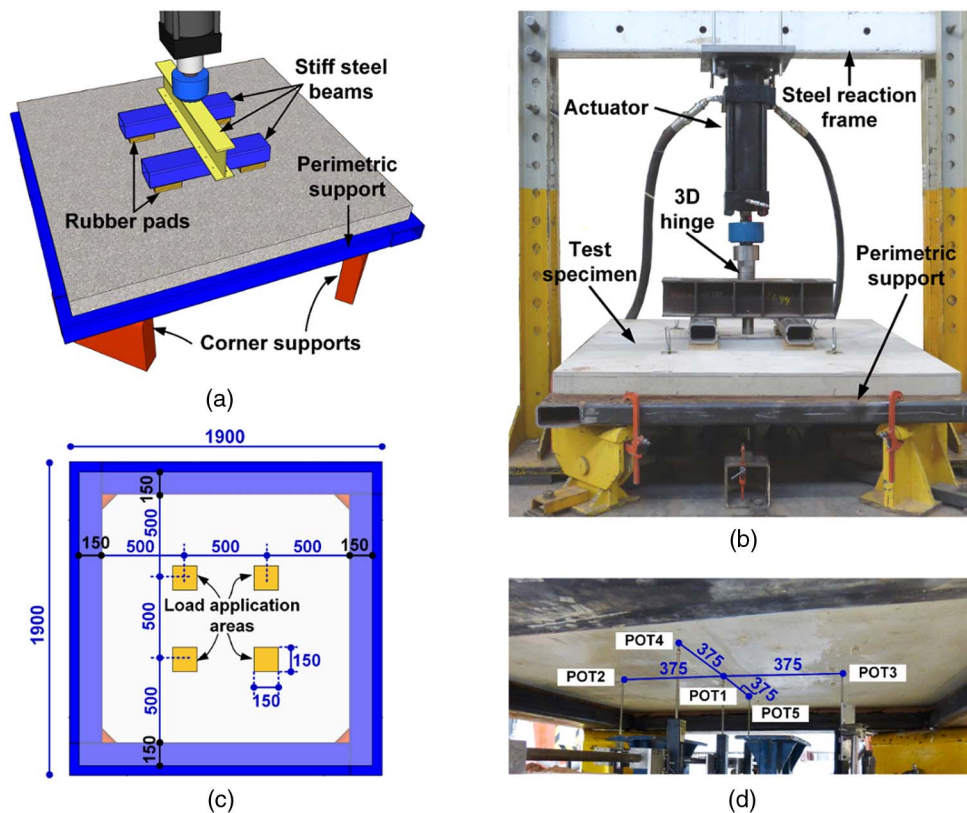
Test setup: (a) schematic 3D illustration; (b) front view picture; (c) top view dimensioning; (d) location of displacement sensors at the bottom to measure deflections (all dimensions in millimeters)
